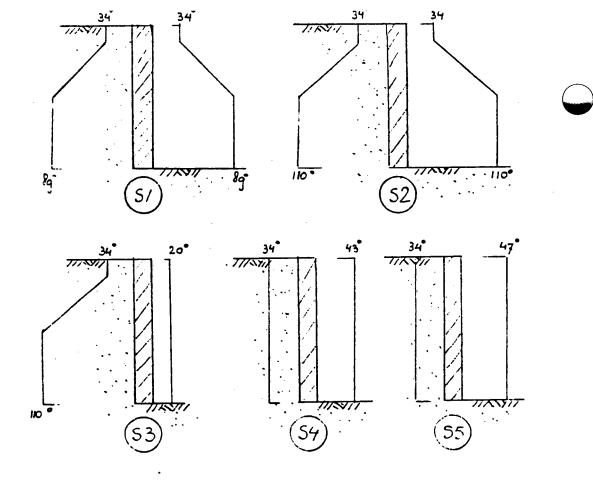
THERMAL LOAD CASES RETAINING WALL
